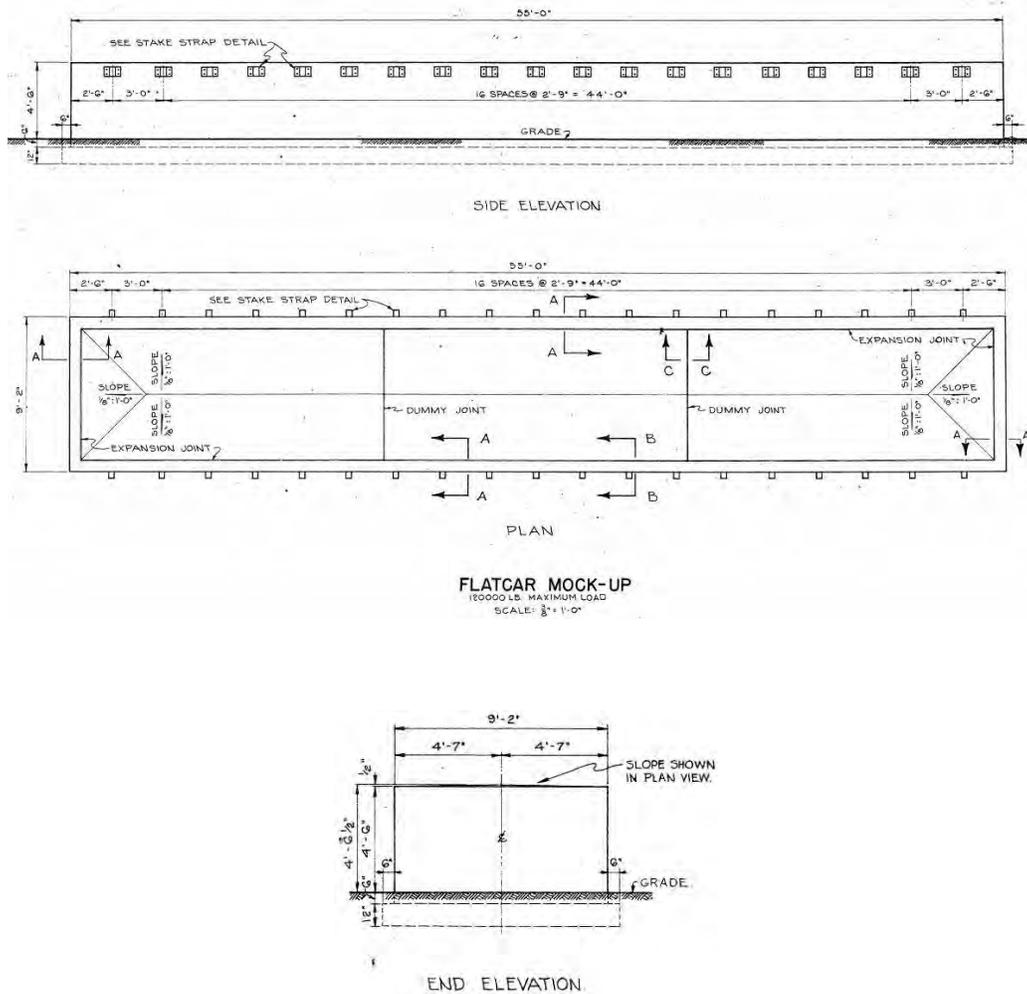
Rail movement mock-up, simulated flatcar (concrete alternate), Fort Bragg, NC, 1952 (standard drawing 28-13-100 sheet 1 of 4; rail movement mock-up, concrete alternate, plan, elevations, and details; 6 February 1952).
